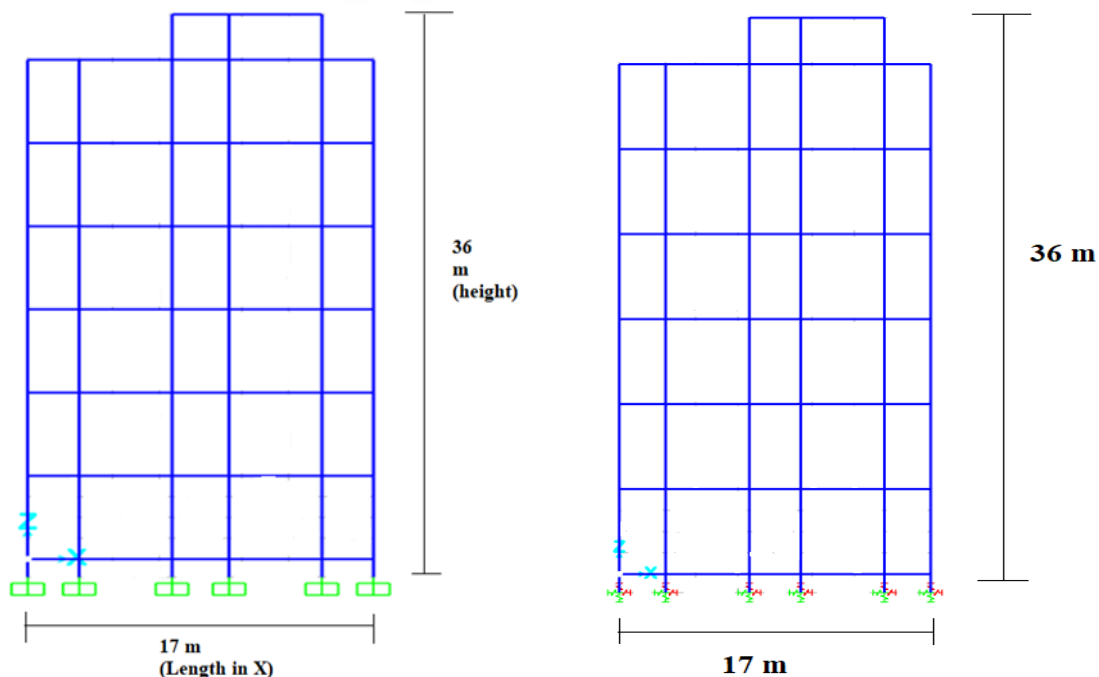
Elevation of model a) building with fixed base, b) building with spring supports
